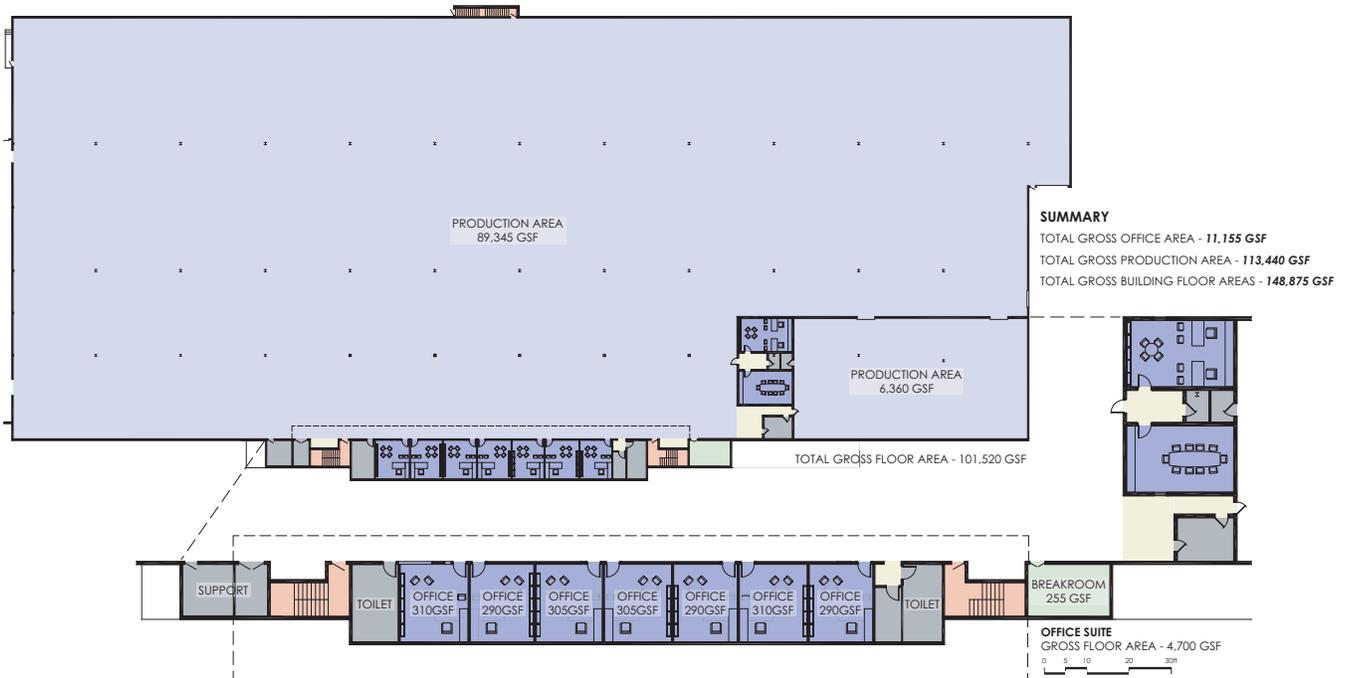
Building 34 - Potential Floor Plan (CJS)
